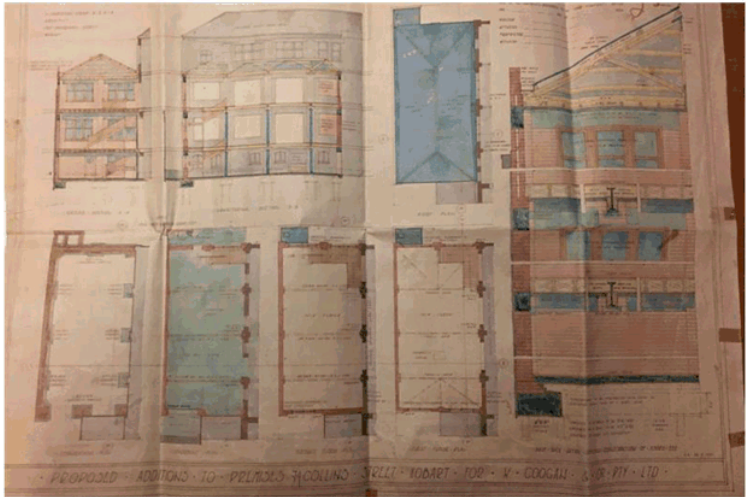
1934 plans for three storey extension (TAHO, AE417/1/1865, 79-81 Collins St (5353))
